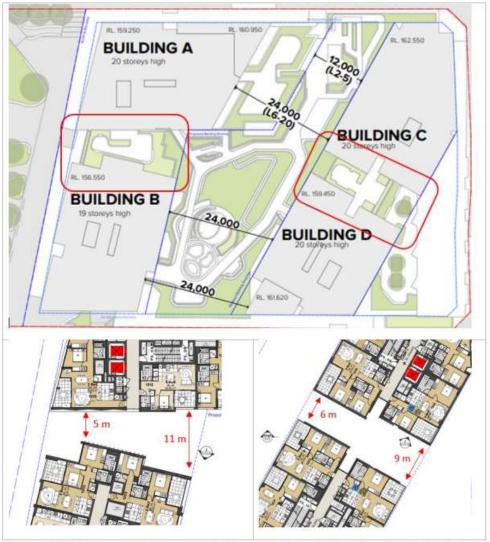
| Building separation across podium communal open space (above) and visual privacy between internal elevations of Building A and Building B (below left) and between Building C and D (below right) (Source: RtS)
